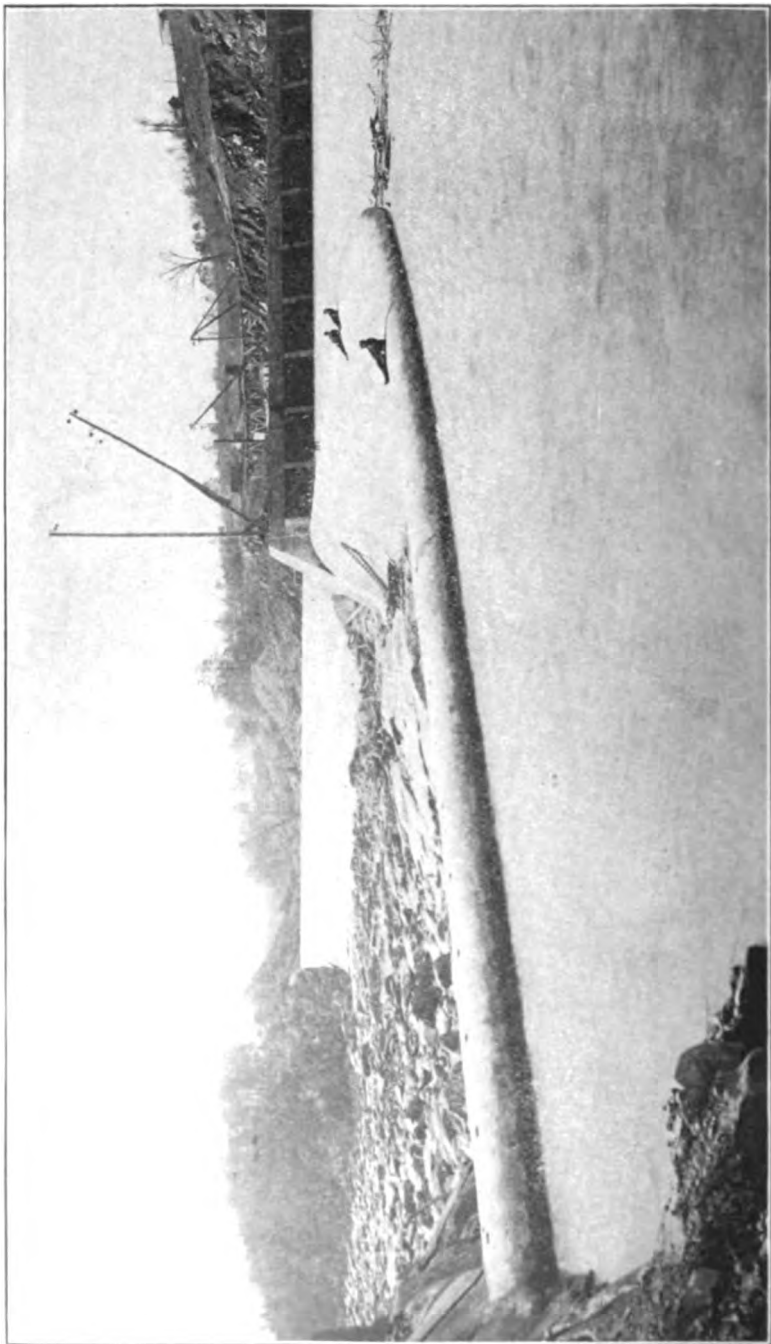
Great Falls dam, showing racks, head gates and method used to obtain long spillway
